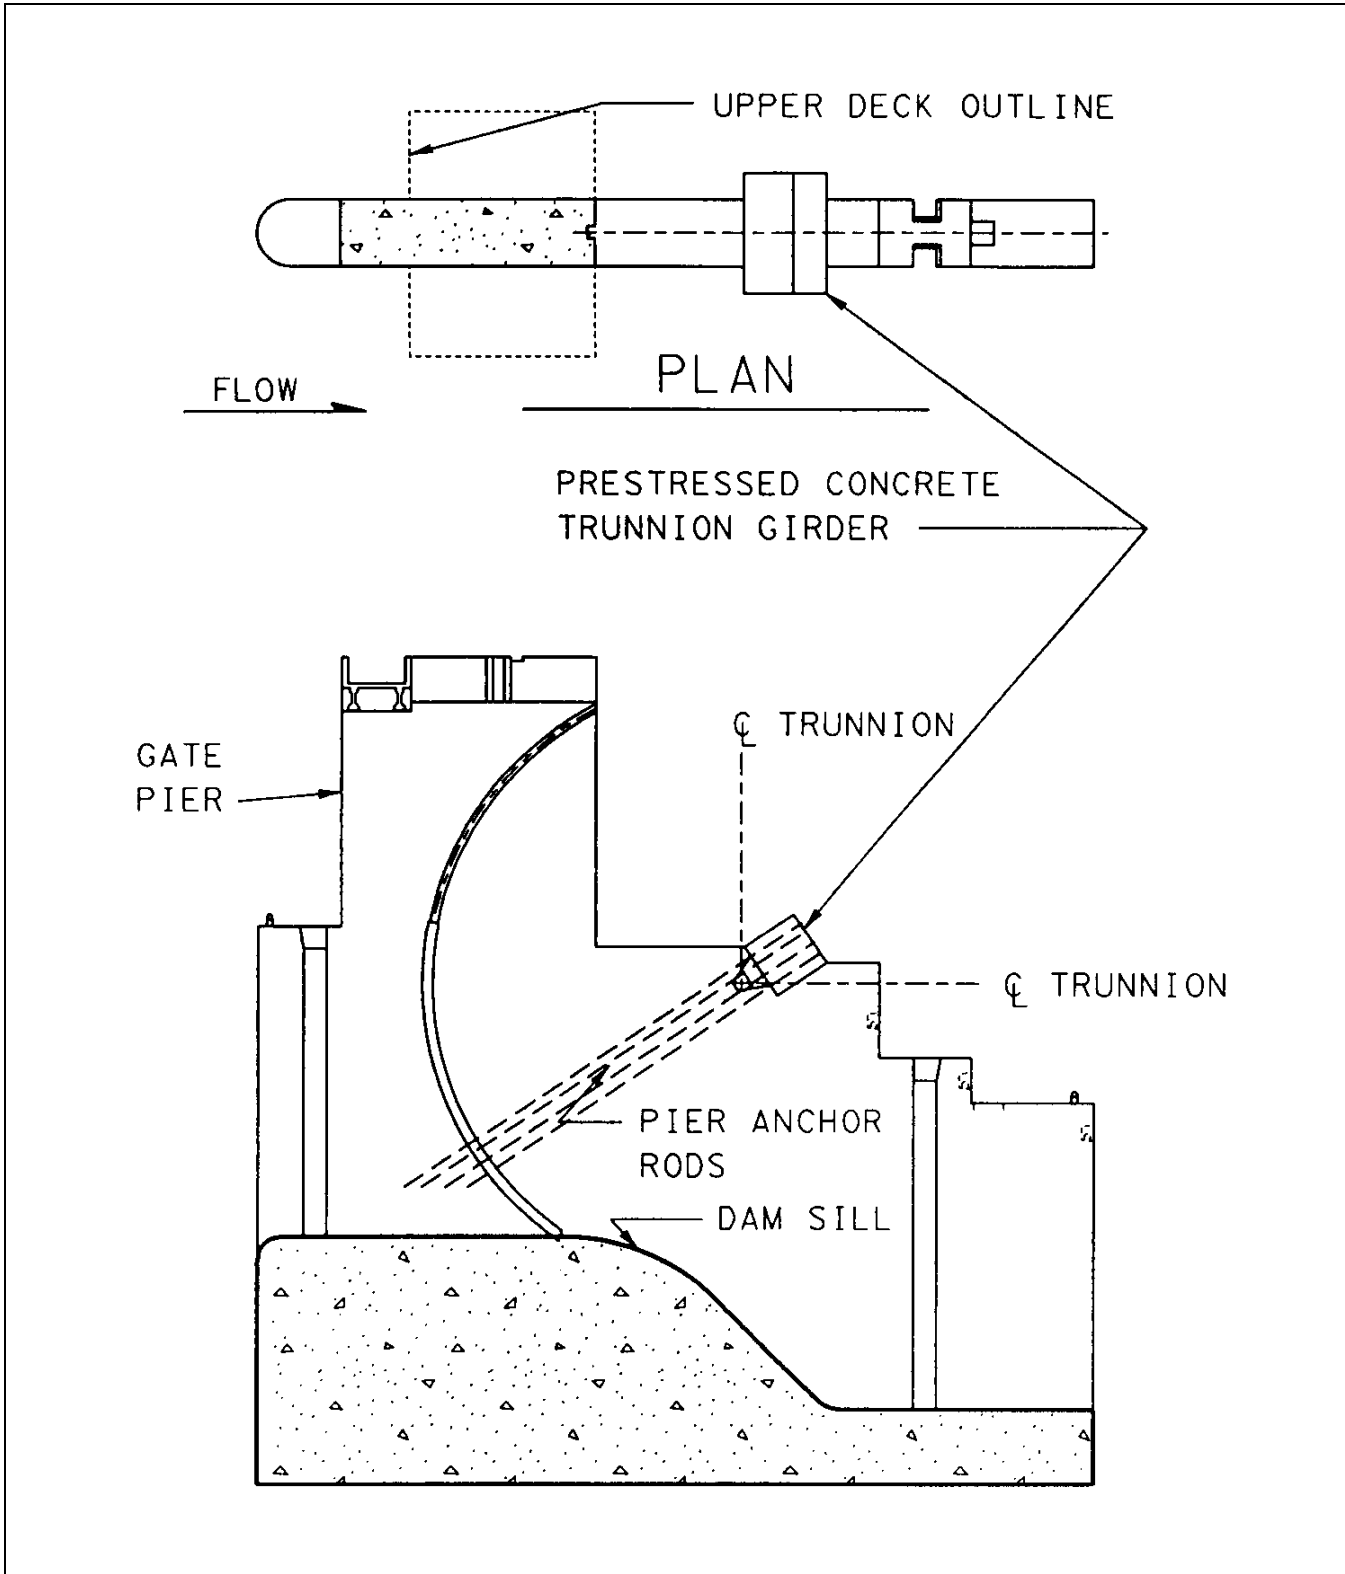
Prestressed concrete trunnion girder and anchor rods
